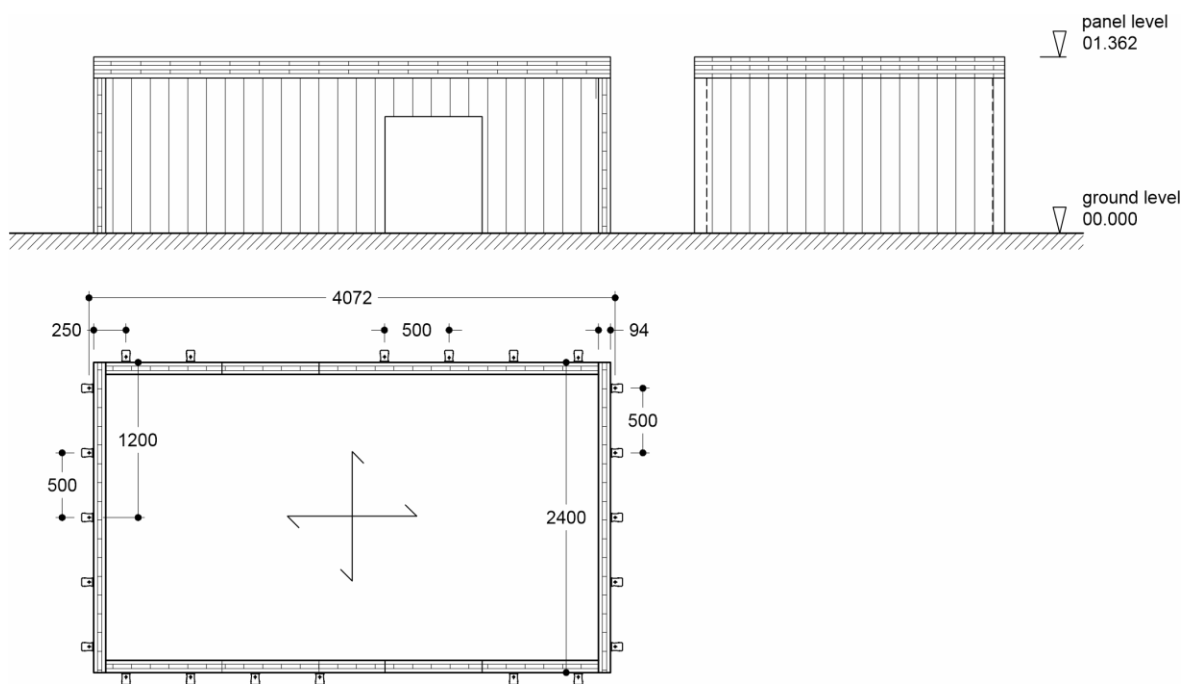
Two-way spanning platform construction (3812, 2212 mm span)
